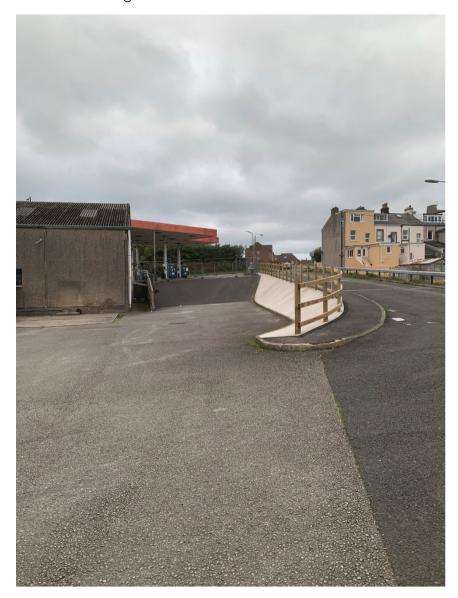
looking south west across the filling station forecourt from the junction of Wyndham Place with East Road
